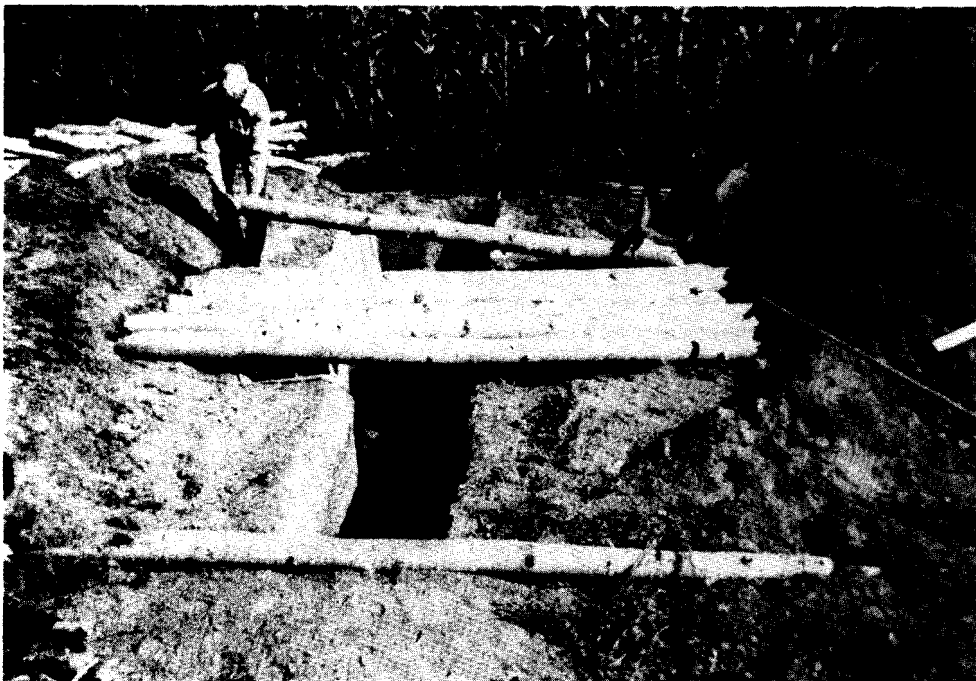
Placing 9-foot poles for the roof of a Pole-Covered Trench Shelter.
